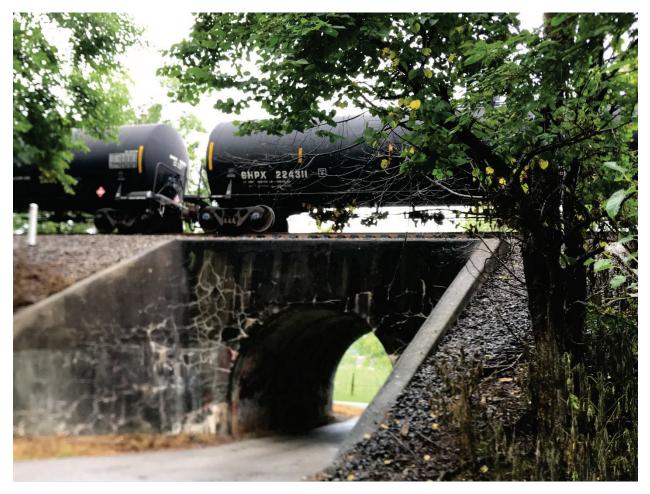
Smith Vaught Road Railroad Overpass (Yellow Route)
